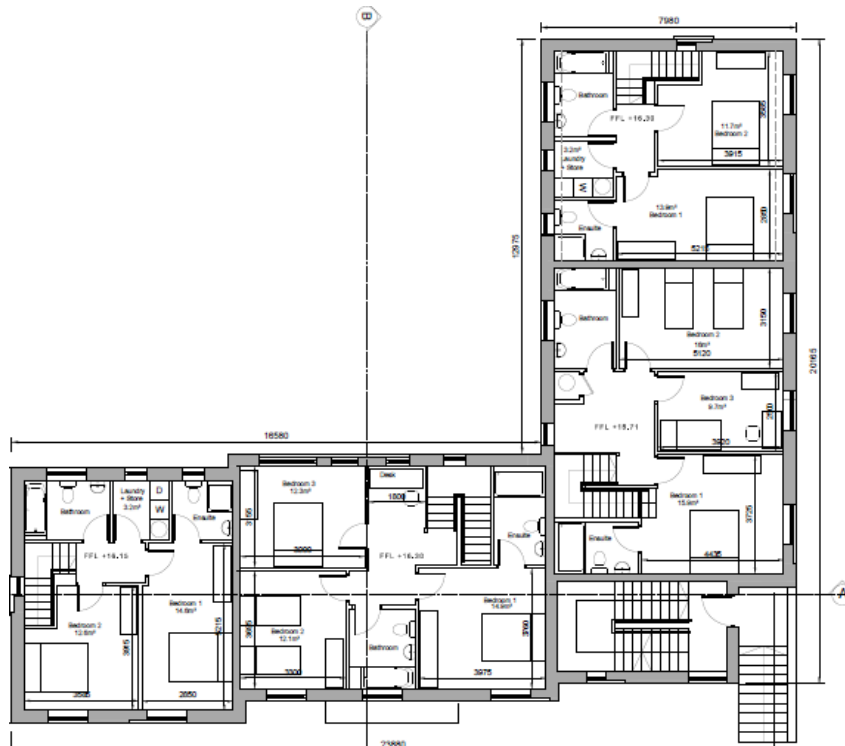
Duplex Apartment Block 1 First Floor layout to be analysed using ADF method
